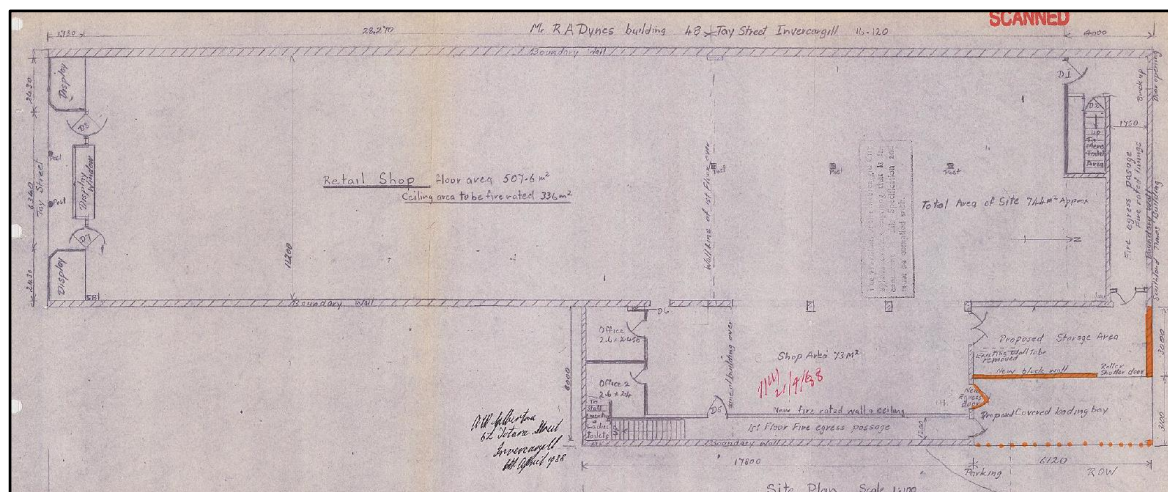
Detail from 1988 plan of the building at 48 Tay Street, showing the floor plan of the shop at this time (Gilbertson, 1988).
